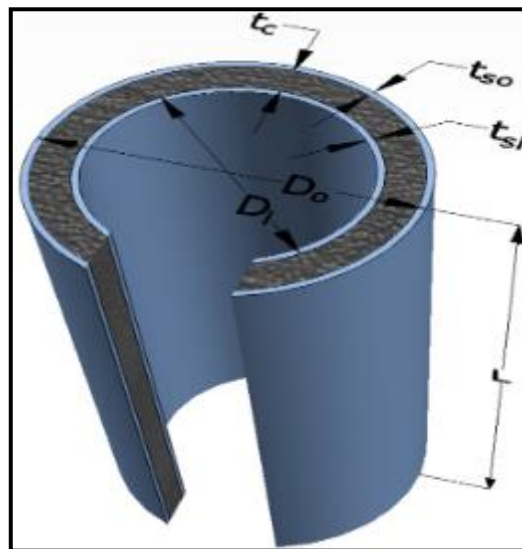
Concrete -Filled Double -Skin Steel Tube (CFDST) Details
